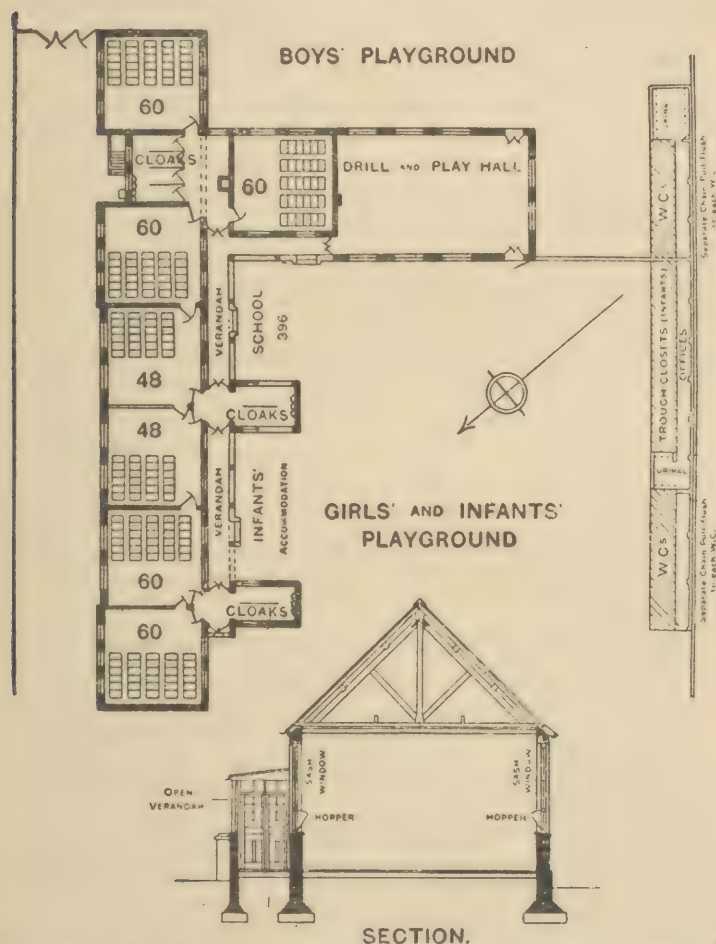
THE STAFFORDSHIRE TYPE OF ELEMENTARY SCHOOL. GROUND PLAN OF INFANTS' SCHOOL, WITH DRILL AND PLAY HALL. ALSO SECTION OF CLASSROOM.
